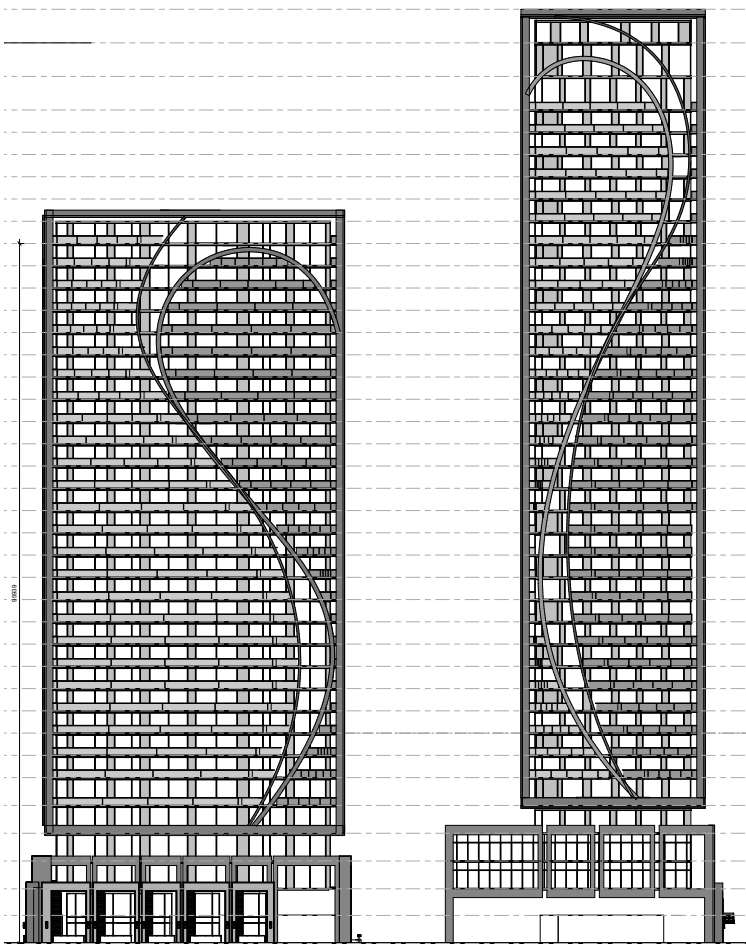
East Elevation (Prepared by: Chamberlan Architects)
